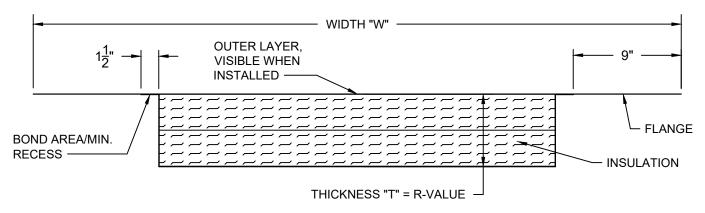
TVB - RECESS ADJUSTED FOR JOINT COVER FRAMES
